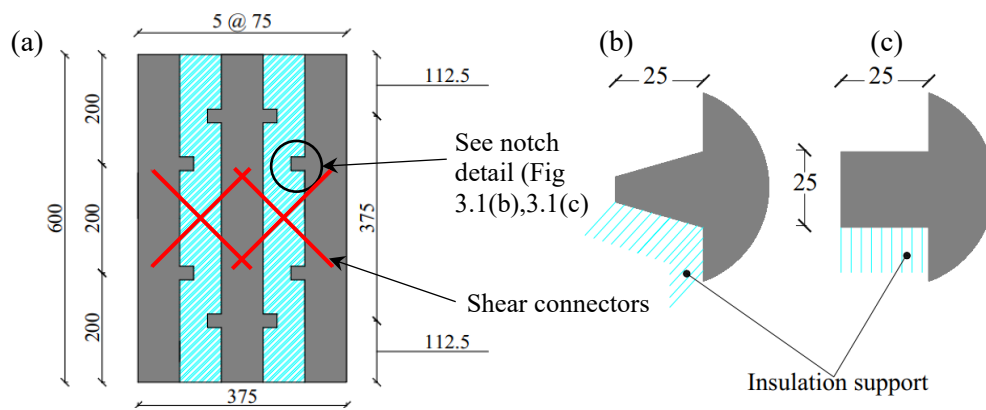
Specimen details (a) overall specimen layout and dimensions (b) trapezoidal notch detail and (c) rectangular notch detail. All dimensions in mm.
